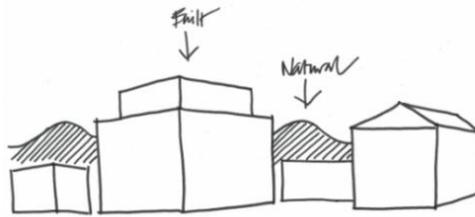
Building rhythm with alternating built and natural views.
